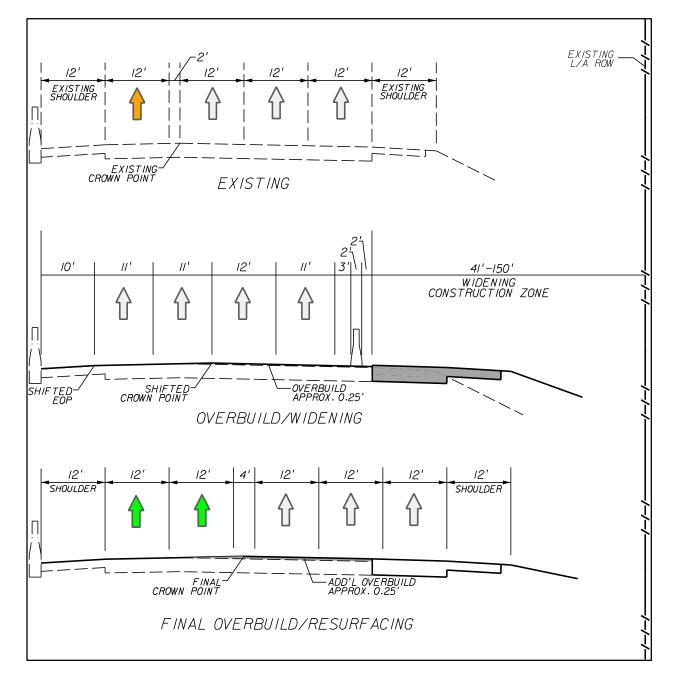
Maintenance of Traffic Typical Section (Mainline Widening without Existing Auxiliary Lane)
